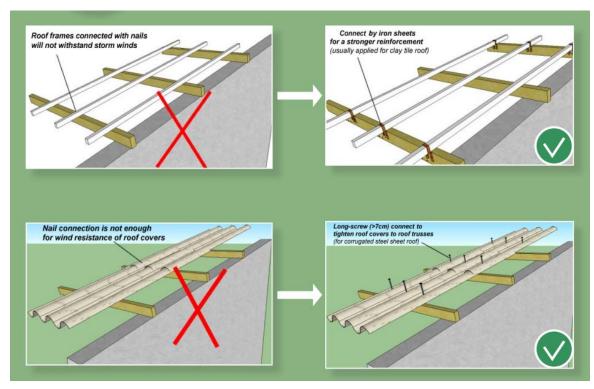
Connection design example for roof tie-downs (Da Nang Department of Construction, 2017)
